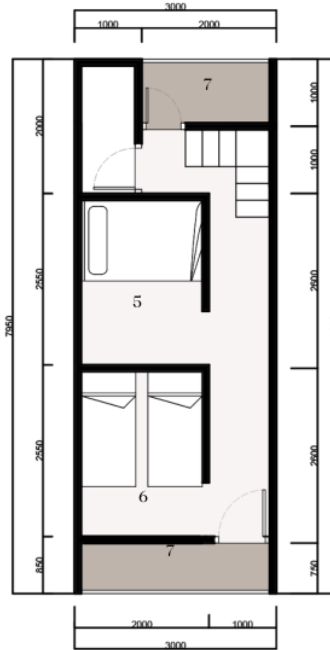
G4 – 2nd floor layout plan, scale 1:100
